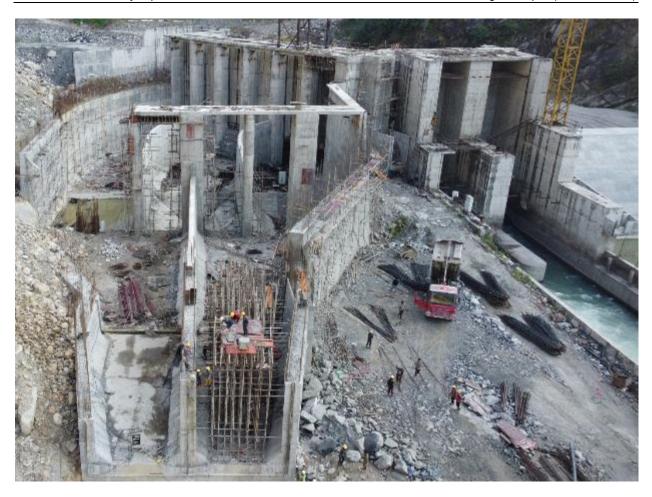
A view of concreting works at conveyance tank and gravel trap
